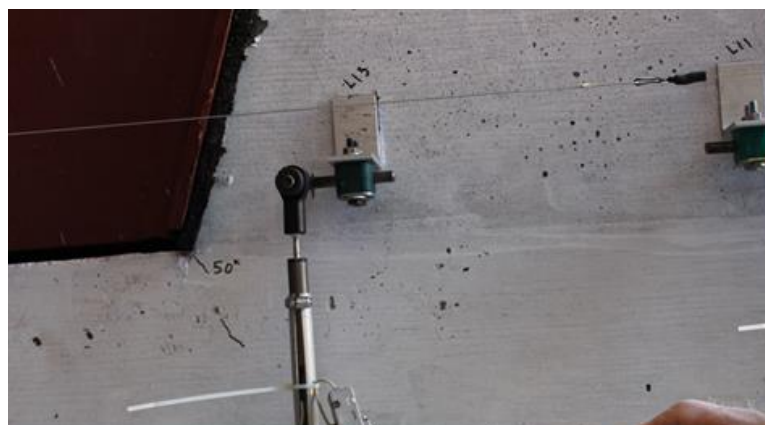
First diagonal crack observed on the east face of shear key 8A
